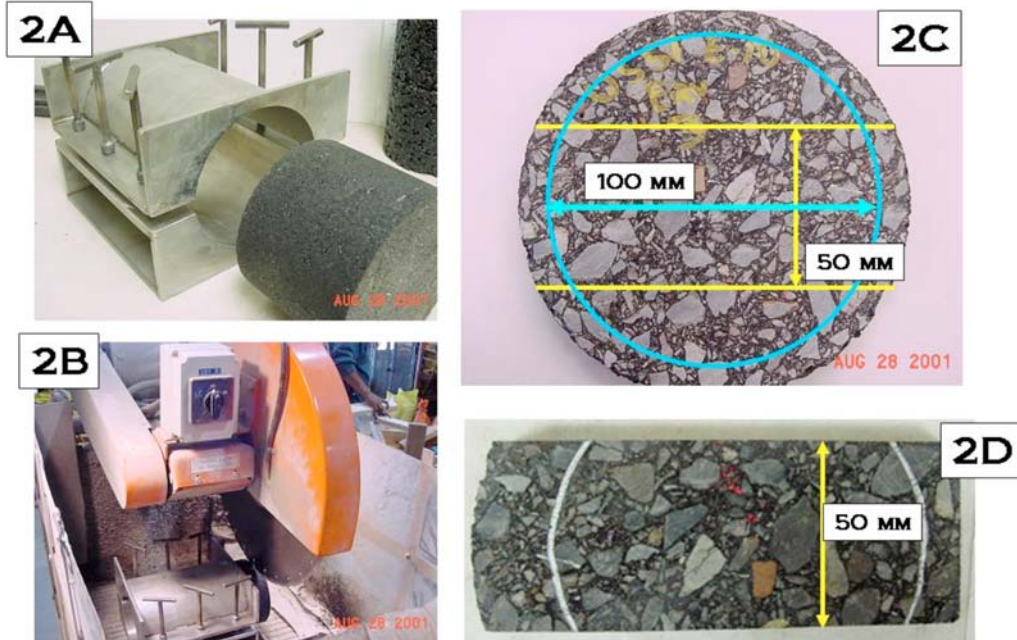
Sample Preparation to Obtain 50-mm Wide by 12-mm Thick Rectangular Specimen
